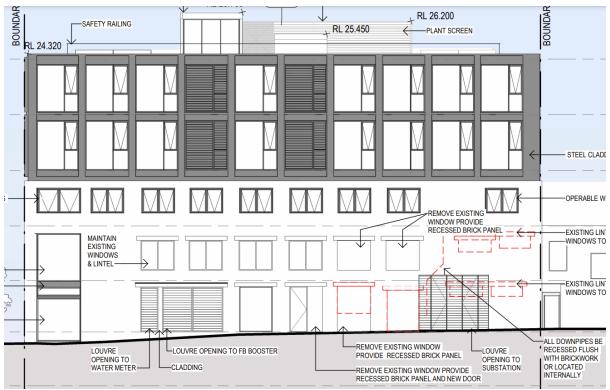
North (Grafton Lane) facade, with proposed bricked-in windows
